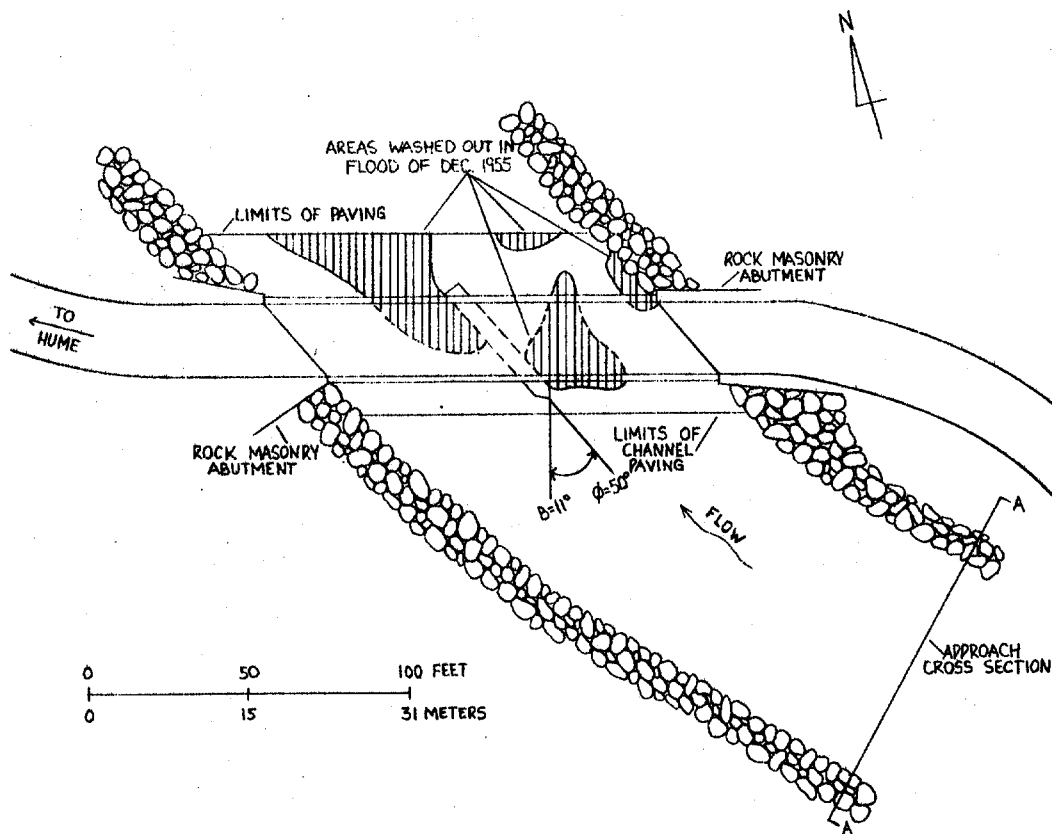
Plan of S.F. Kings River at SR-180 crossing.
